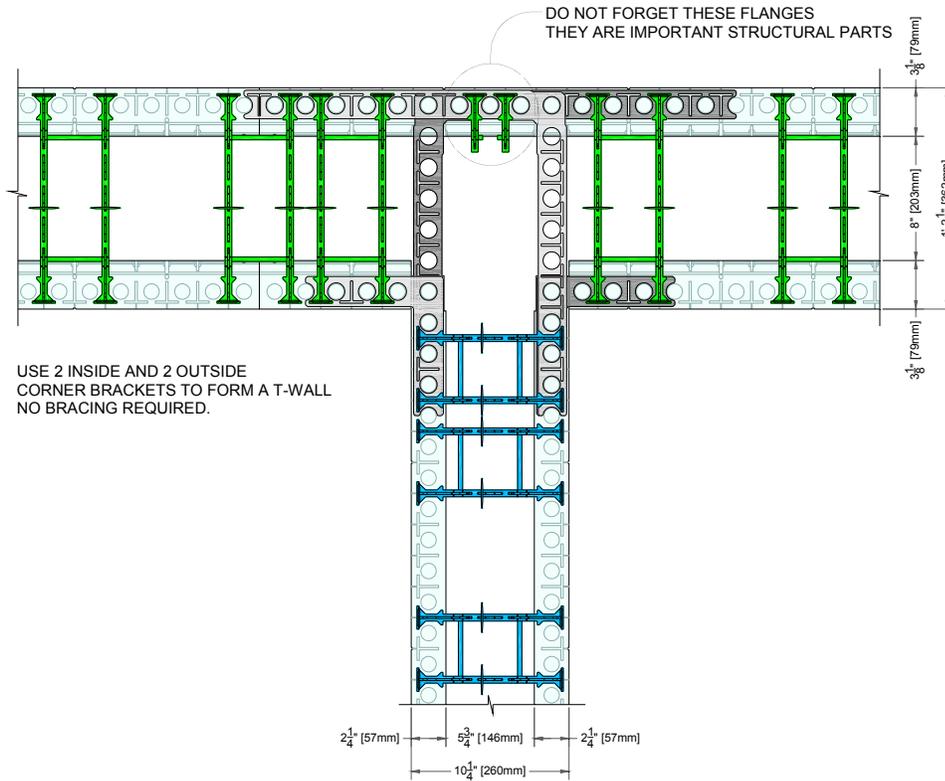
T-Wall Assembly w/ two Outside and two Inside Corner Brackets (plan view)
